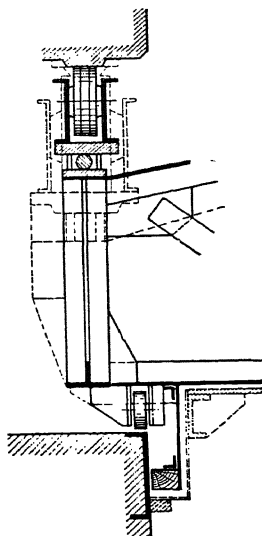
The M.A.N. water-seal for a double-sluice gate. Plan.
